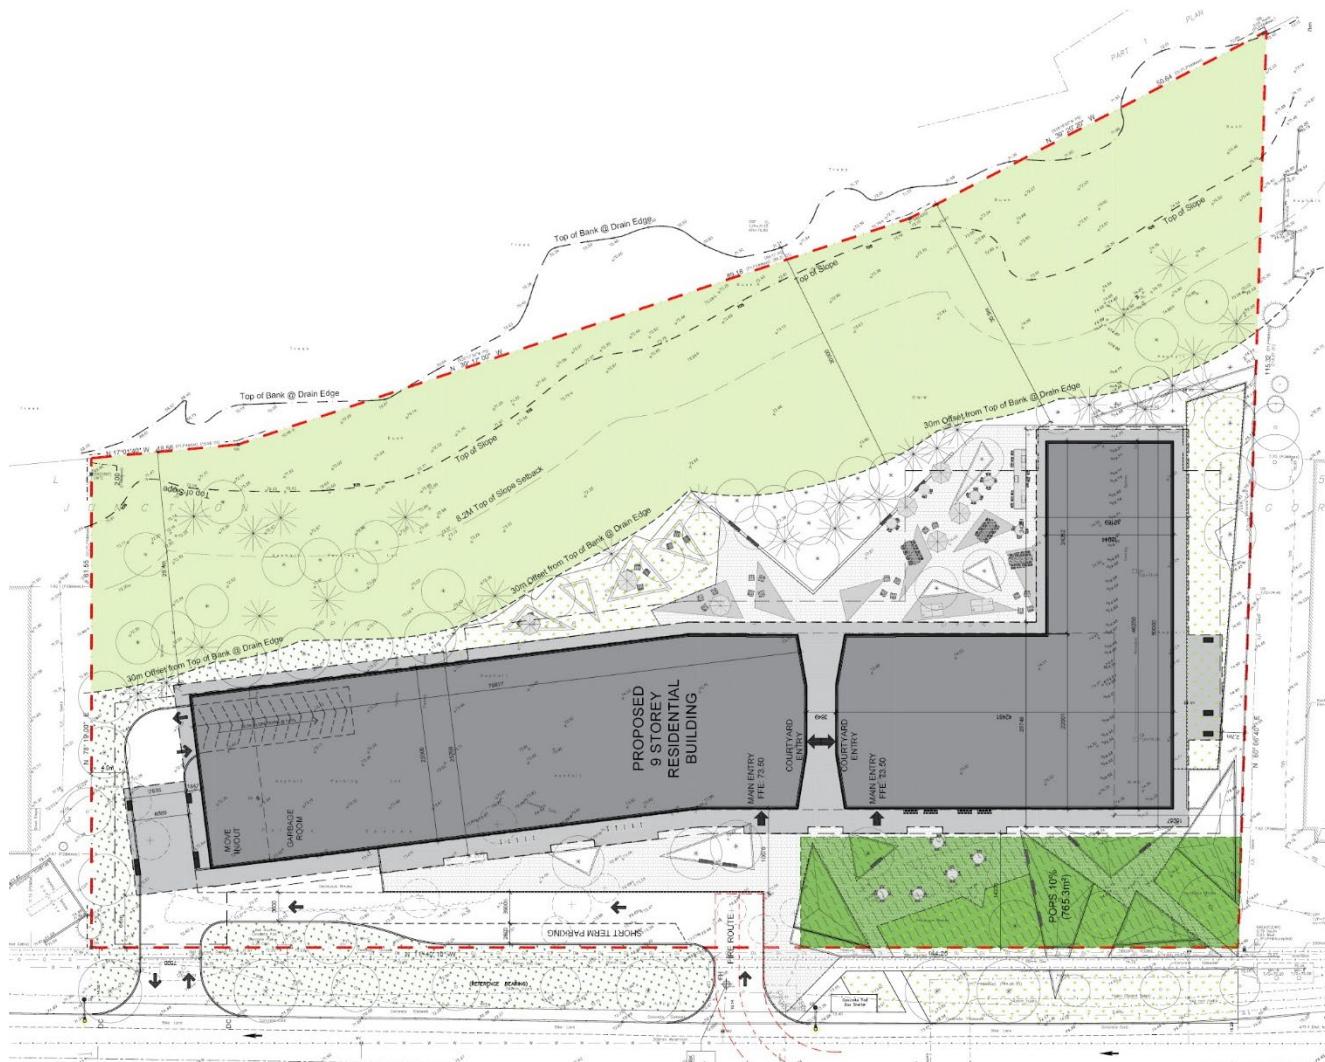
Site Plan of proposed development. The proposed POPS is highlighted in dark green.
